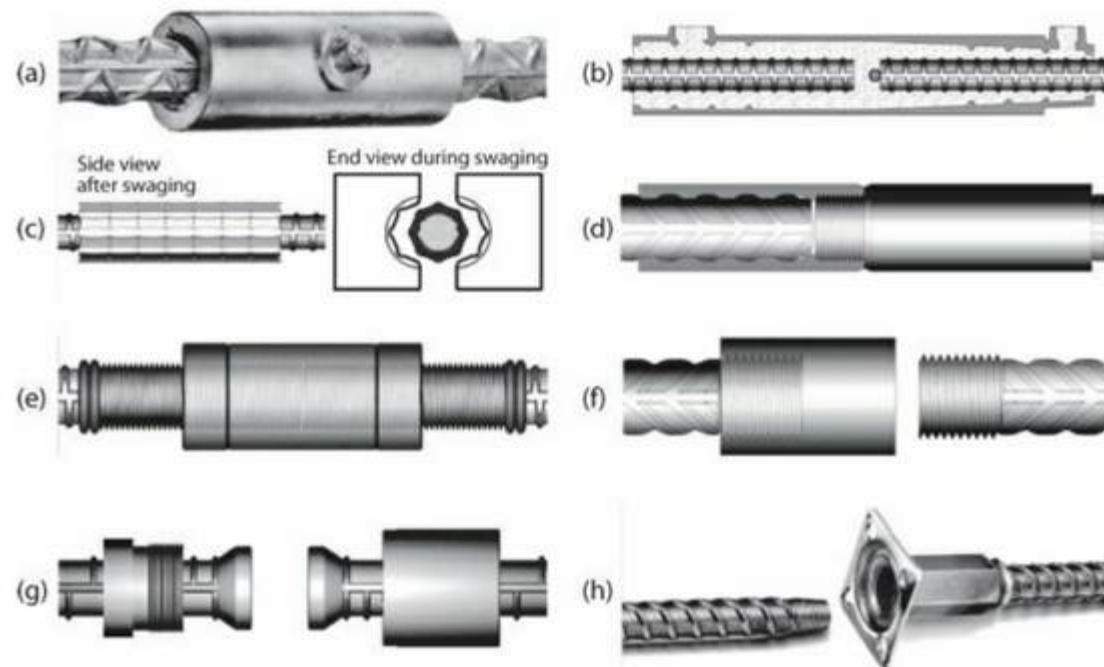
Various mechanical splice types: (a) steel-filled coupling sleeve; (b) grout-filled coupling sleeve (section); (c) cold-swaged steel coupling sleeve; (d) extruded steel coupler with parallel threaded ends (partial section); (e) friction-welded bar position coupler with parallel threaded ends; (f) threaded coupler with upsized bar threads, cold-forged; (g) upset bar and coupling sleeve with straight threads; (h) coupler with taper threads and mounting plate (to splice bars across construction joints after removal of formwork). (After ACI 439.3R-07, 2007, courtesy of American Concrete Institute.)
